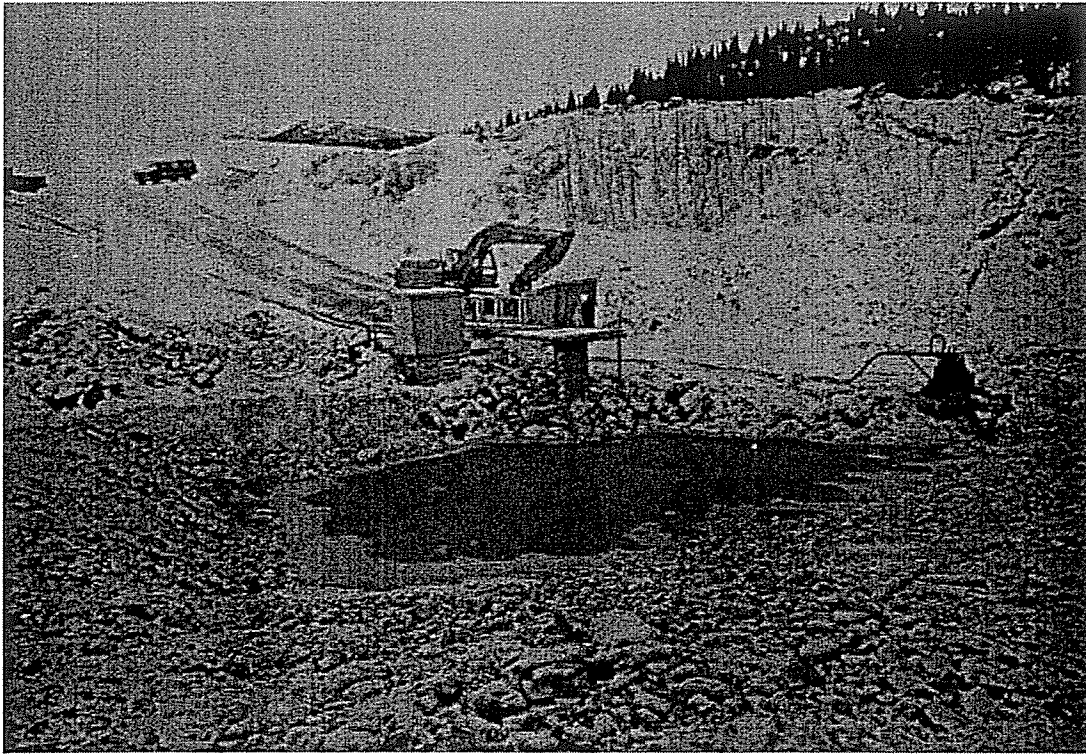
View of the seepage pond, note gravel was placed inside the toe of the pond
